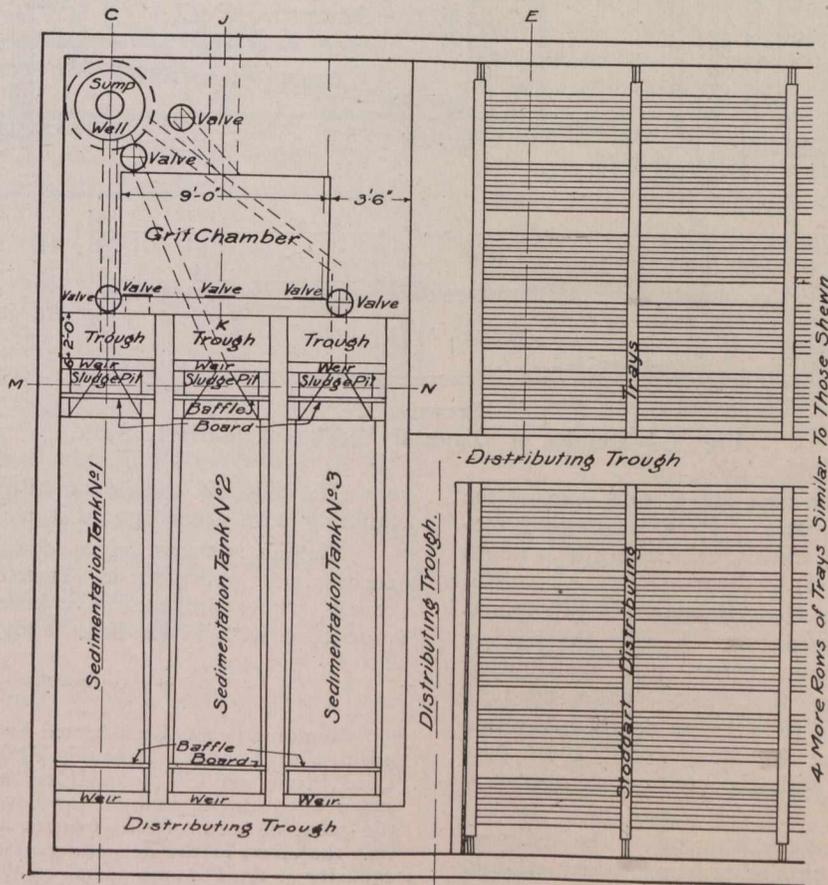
Plan of Part of Disposal Works Showing General Arrangement.
